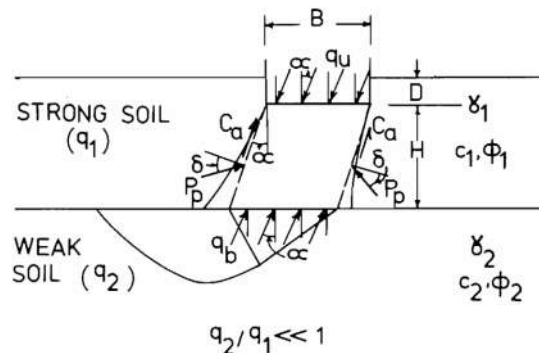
Failure of soil below footing under an inclined load on strong layer overlying a weak deposit (Meyerhof & Hanna, 1978).
